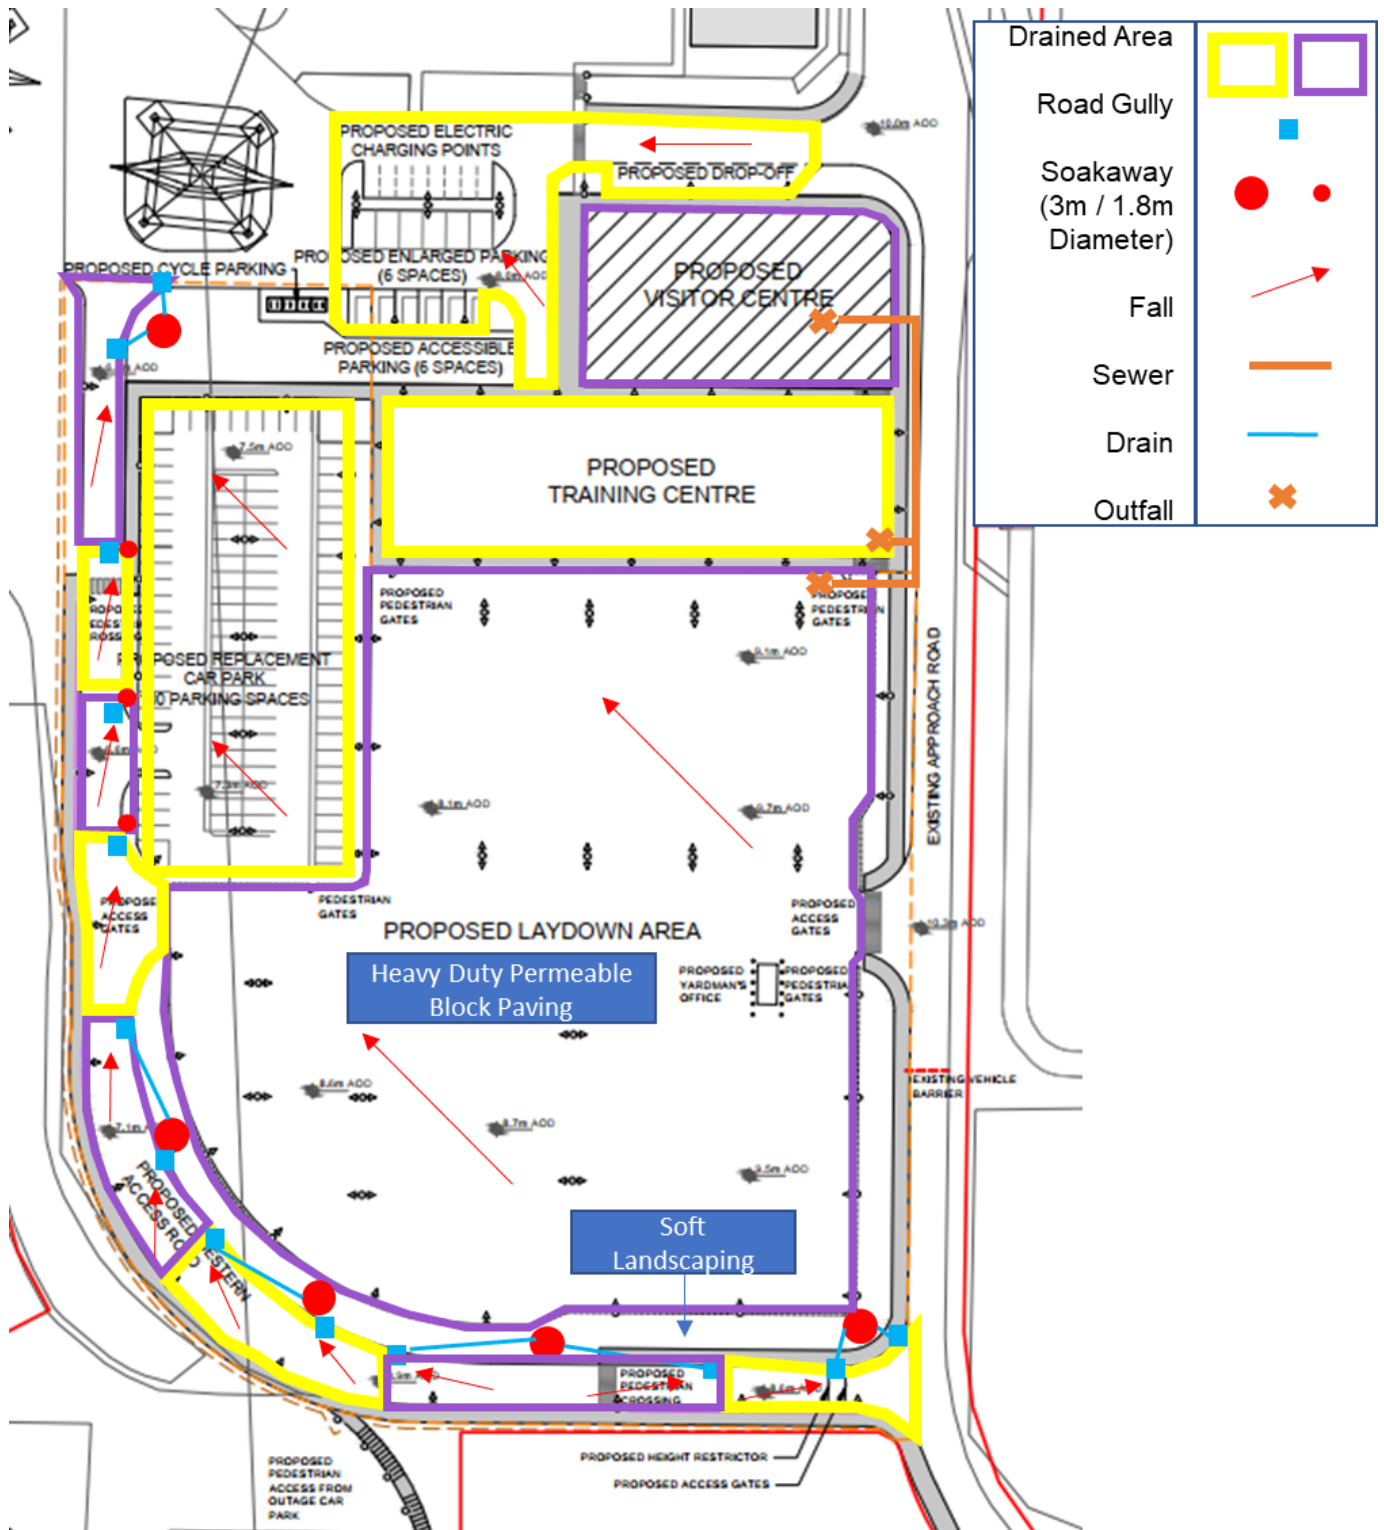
Car Park and Laydown Area Proposed Drainage Strategy Schematic
